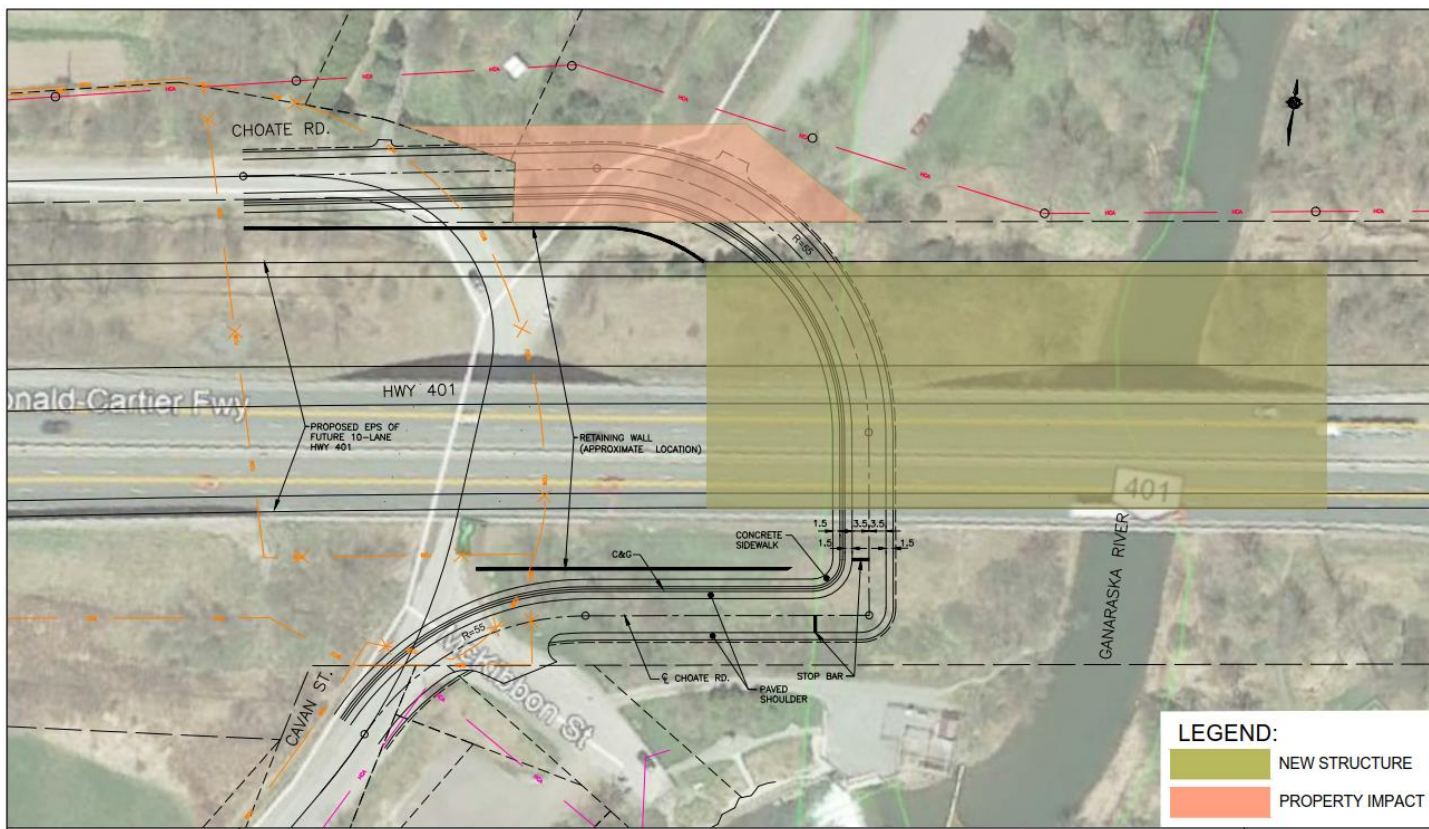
Choate Road and Ganaraska River bridges Alternative 3C
